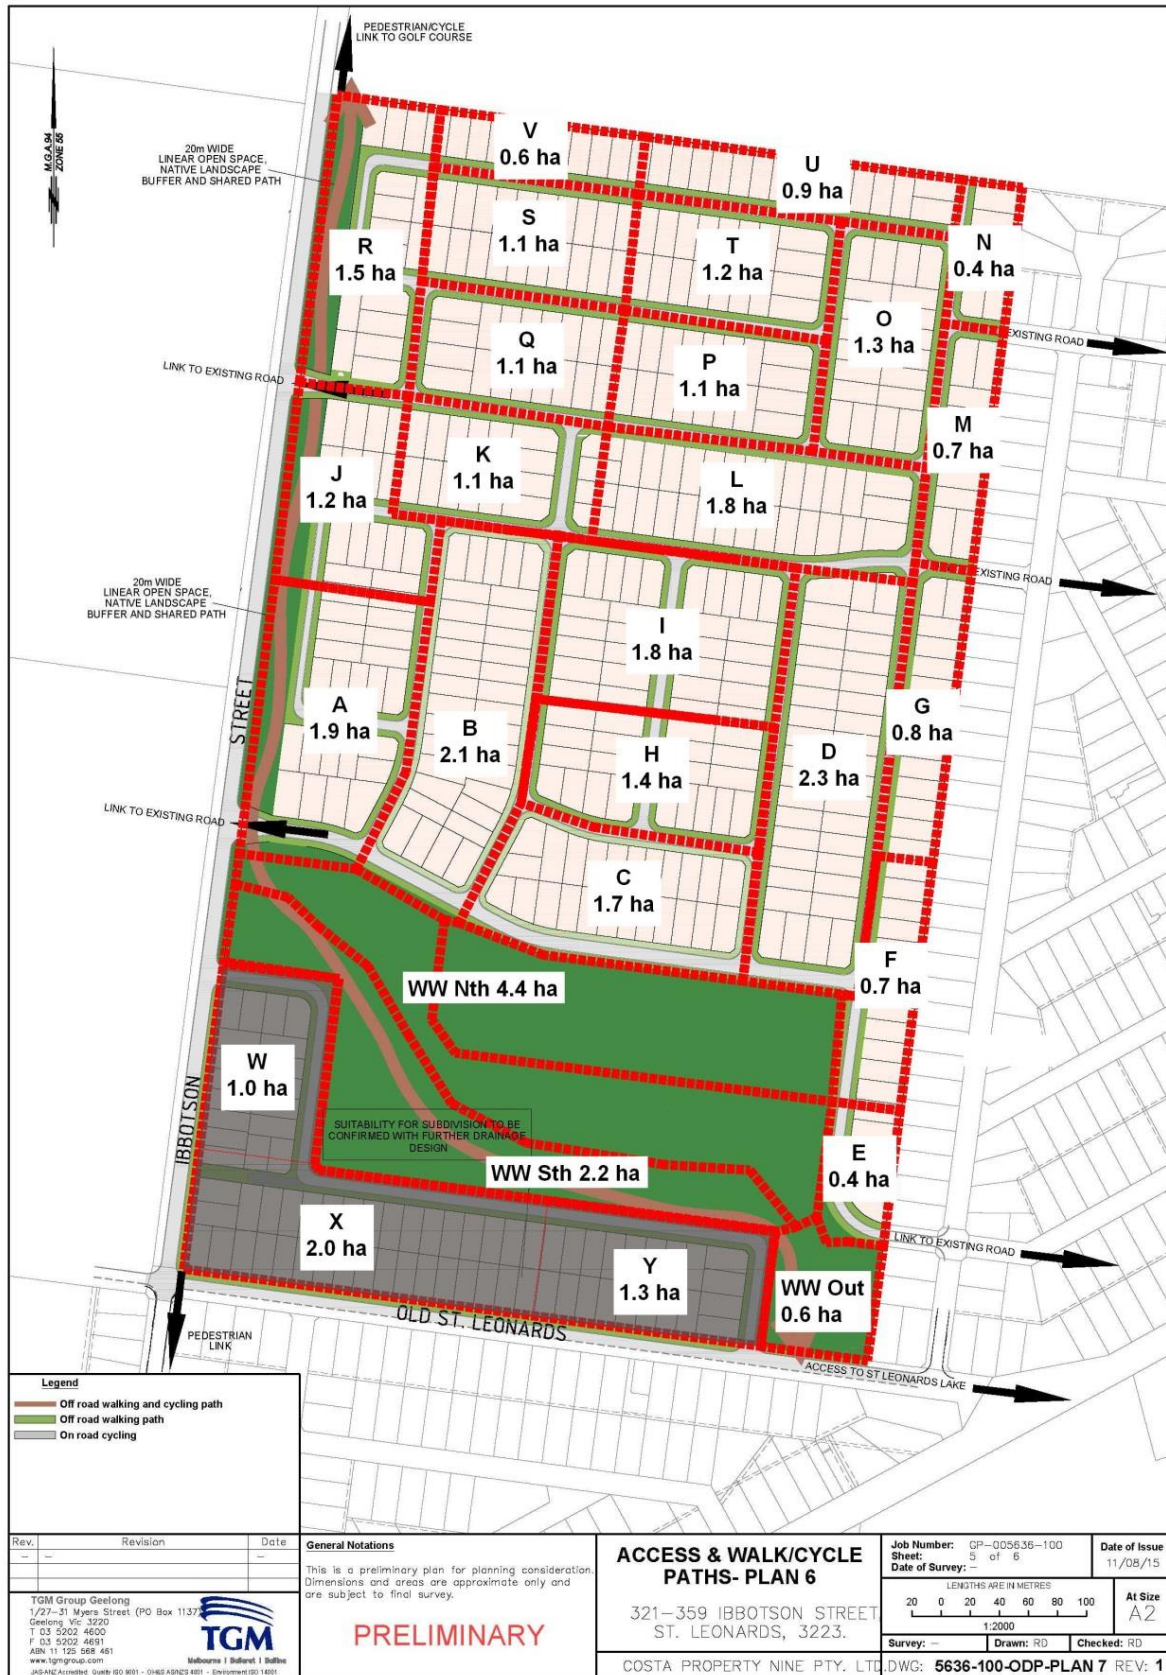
Ibbotson Street preliminary development plan and sub-catchments
